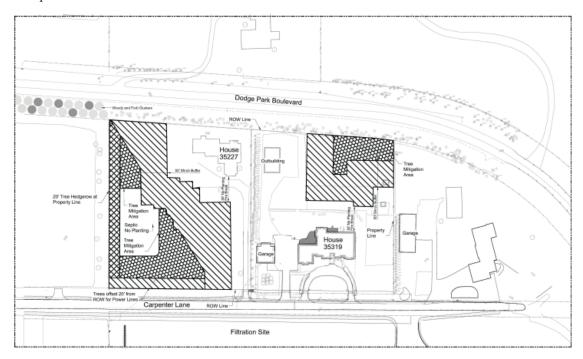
Carpenter Lane Planting Diagram (Full Plan included as 00-LU-412 in Exhibit 1)
